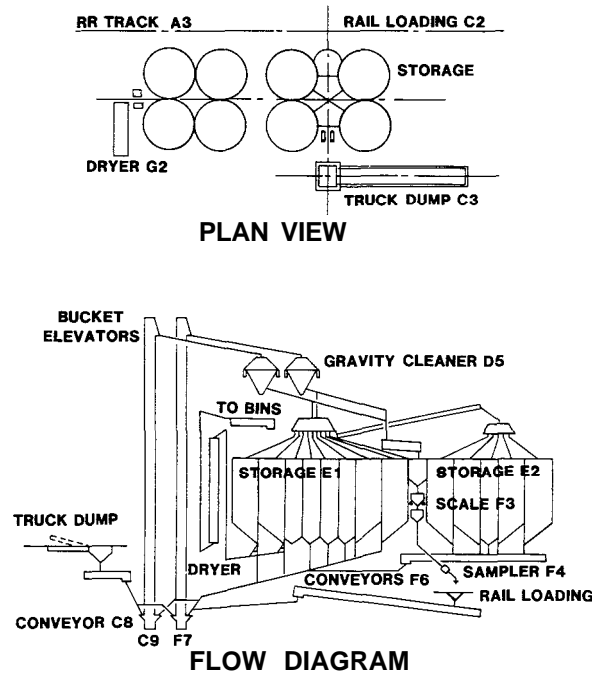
Flow diagram and plan view of 50-car loadout corn-soybean facility.
